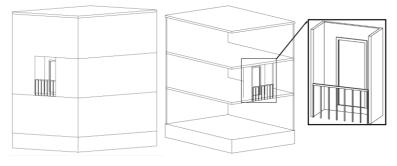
REVIT BIM MODEL – BALCONY OVERHANG – LEFT: 3D VIEW. RIGHT: 3D VIEW OF BALCONY DETAIL
